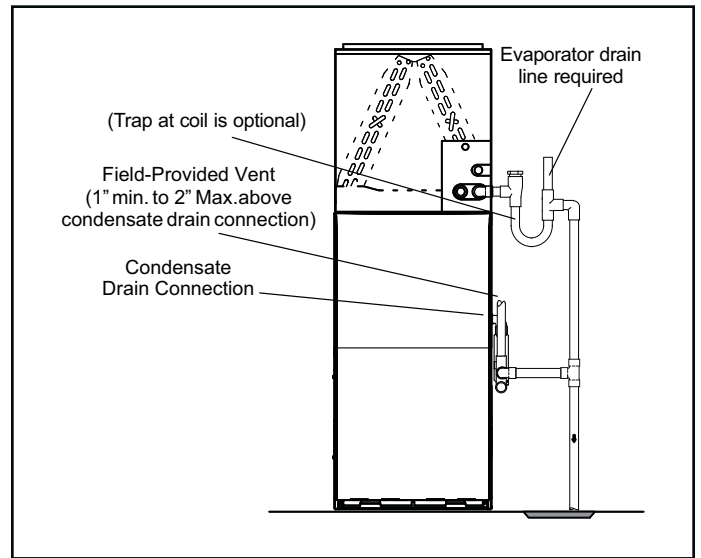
Furnace with Evaporator Coil Using a Common Drain
